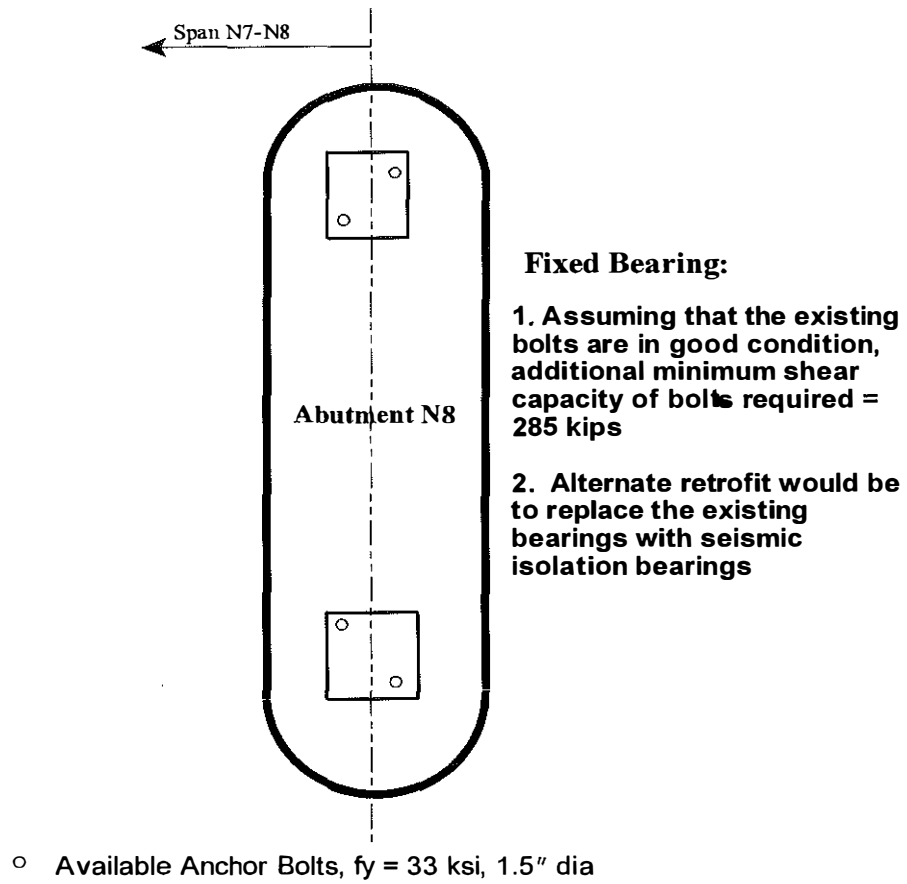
Minimum Required Shear Capacity ( $V_{req}$ ) to be Provided by Additional Anchor Bolts at Bearings of Pier N8 on the Evansville, IN Approach of the US41 Northbound Bridge
